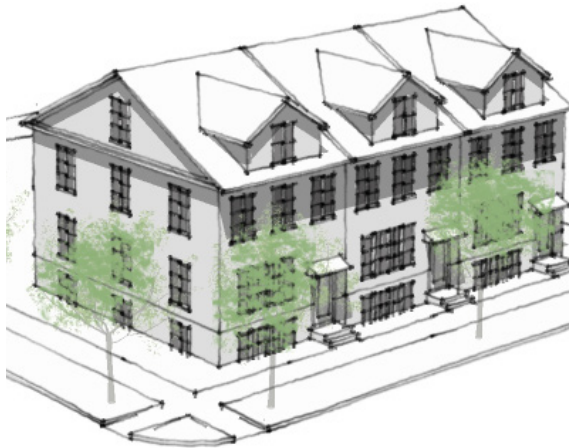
Row building example with stoop entrances, visible basement, and a pitched roof with gables
